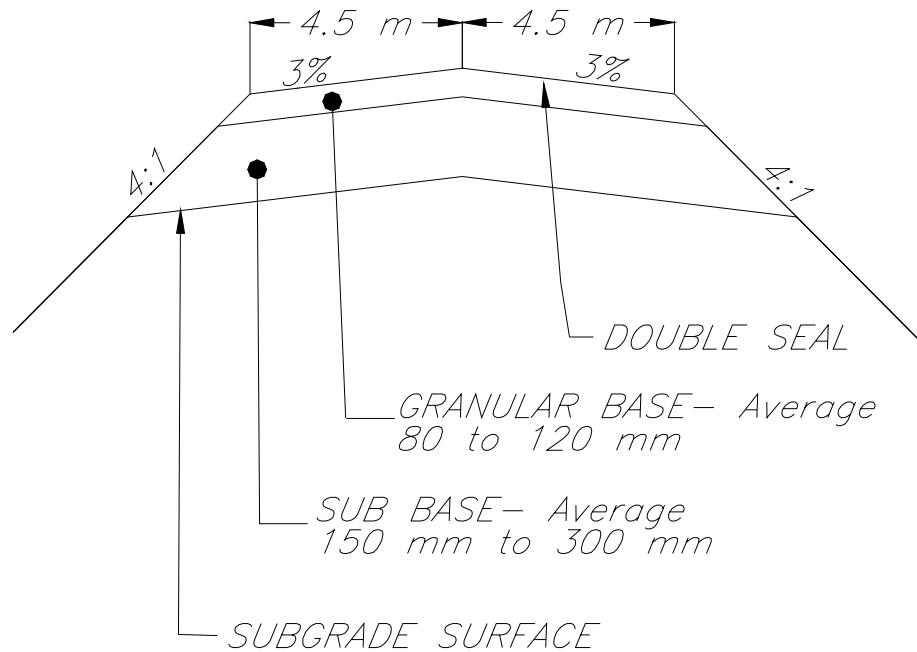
TYPICAL CROSS SECTION FOR SECONDARY HIGHWAY
